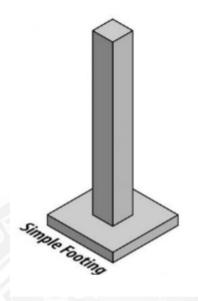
Flat, Plain, or Reinforced Isolated Footing
